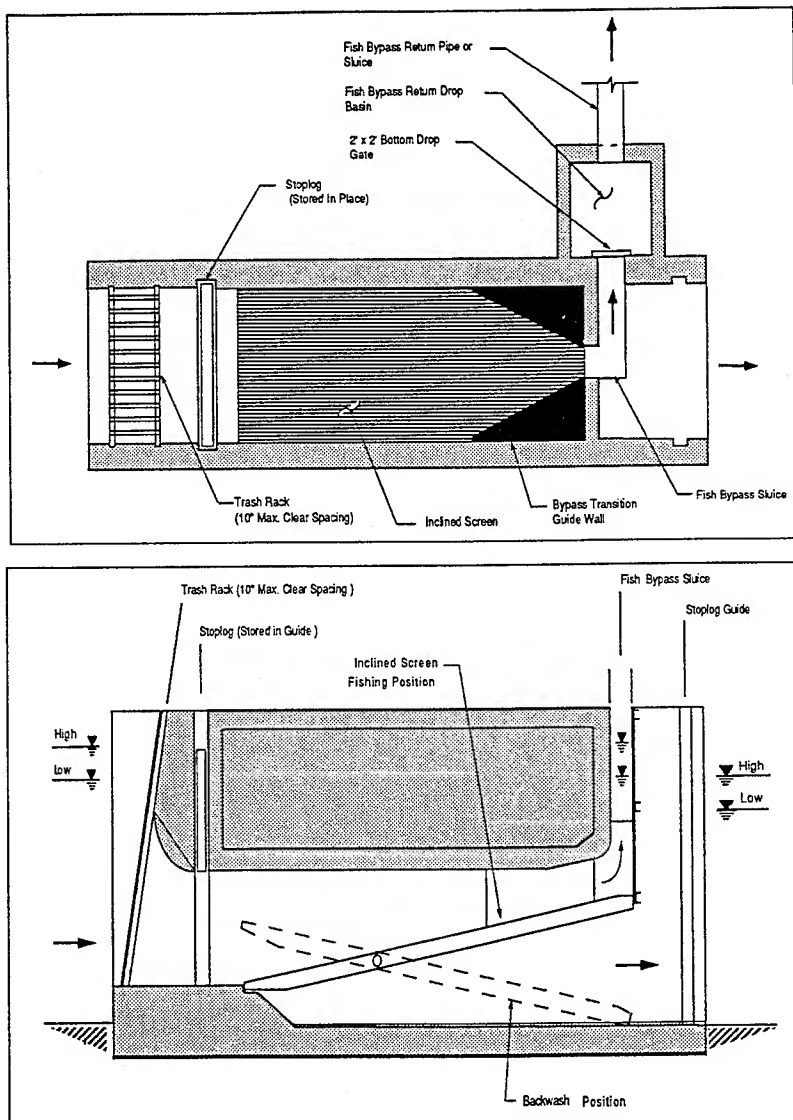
Plan and section view of the Modular Inclined Screen (MIS).
